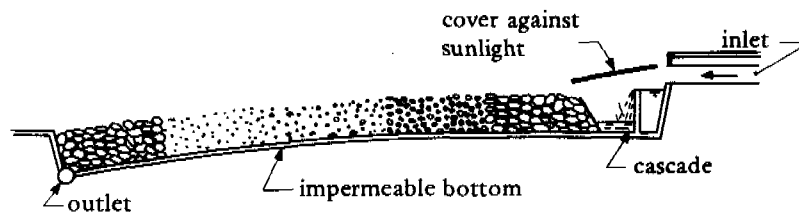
Typical layout of a horizontal flow prefiltration
